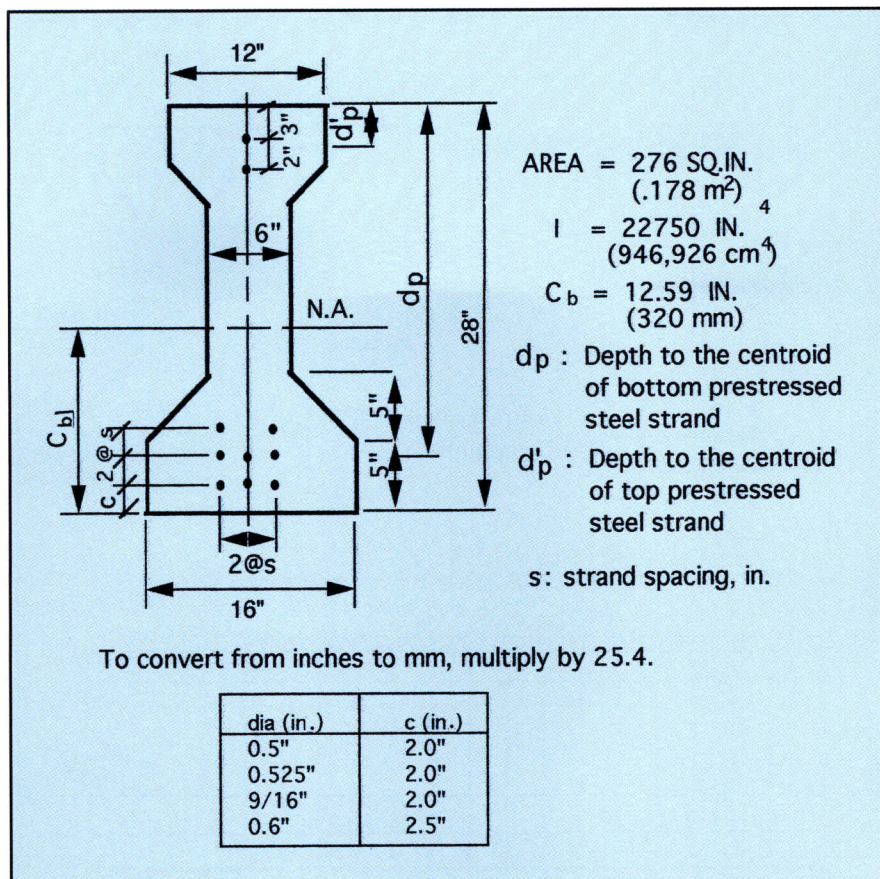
AASHTO Type I beam cross section. Strand pattern and strand spacing.
